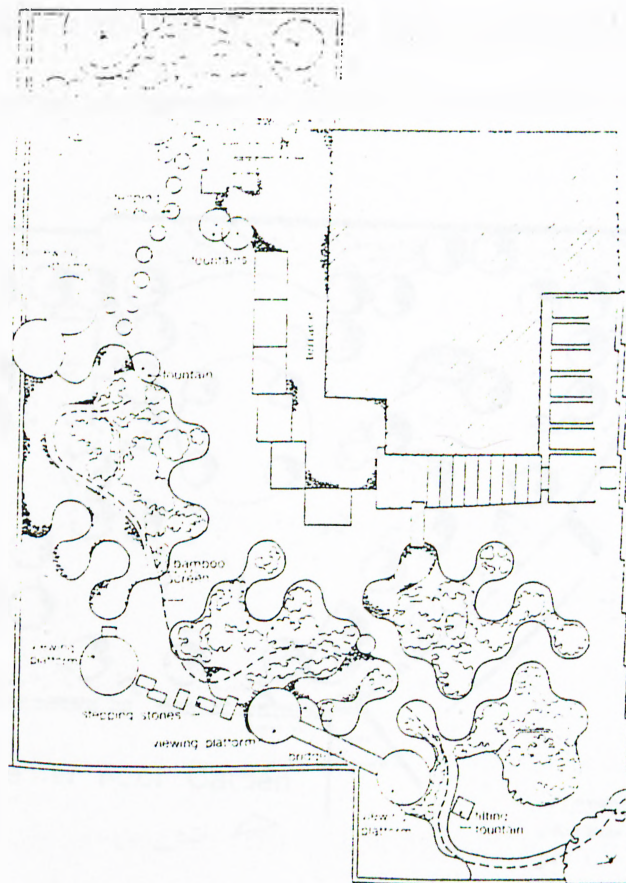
Plan of the roof garden at Harvey's Store (Scrivens, 1982c, p. 86)
